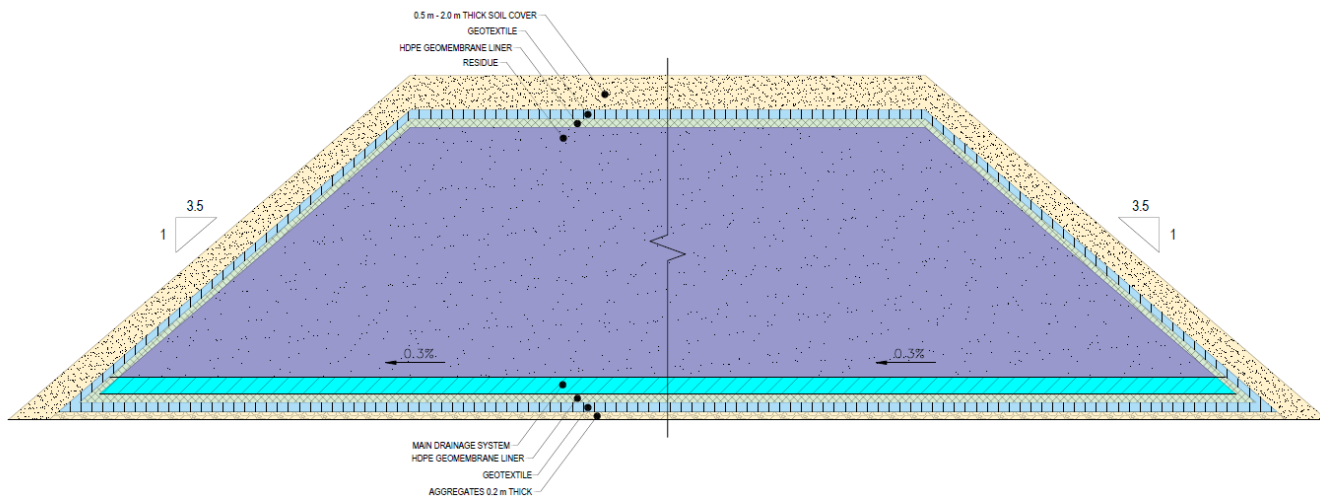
Residue Storage Facility Design – Typical Cross Section
